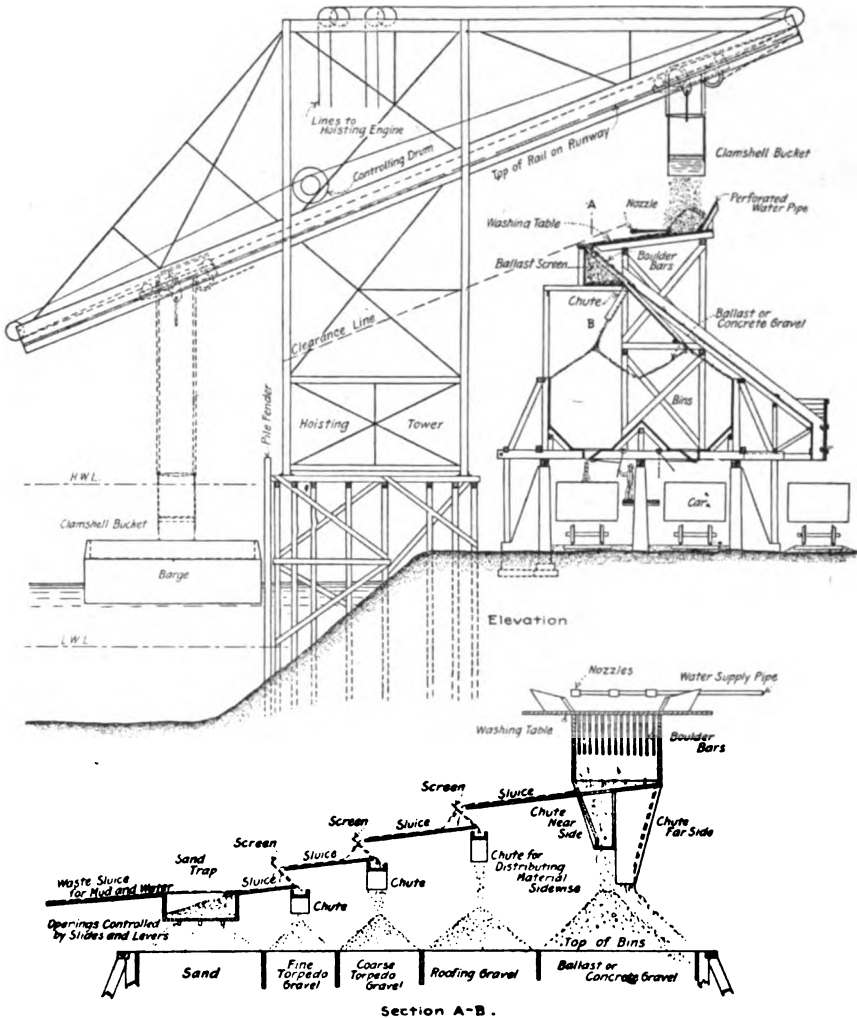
TYPICAL GRAVEL HANDLING PLANT.
